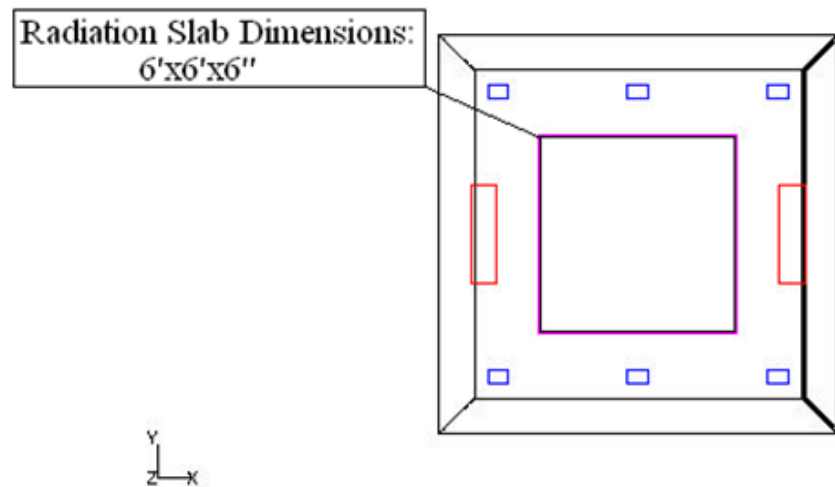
Case 4 – Plan View of Six Inlet Vents on the Floor; Two Outlet Vents in the Ceiling and the Radiation Slab on the Ceiling
